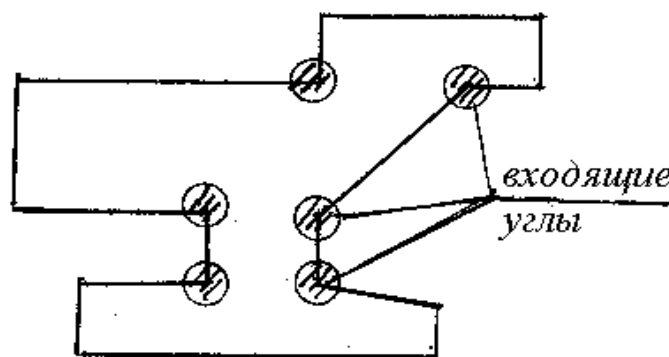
A fragment of a complex plan with dangerous places at the incoming corners of the building
